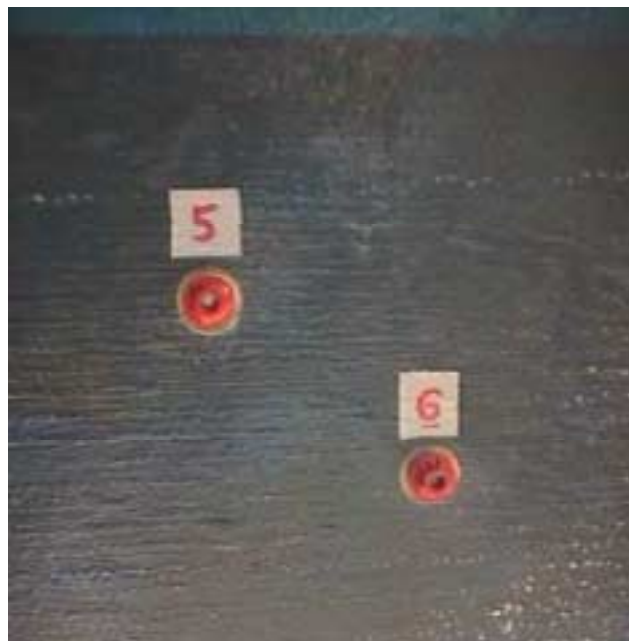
Locations of the pull-off tests conducted on bridge deck.
